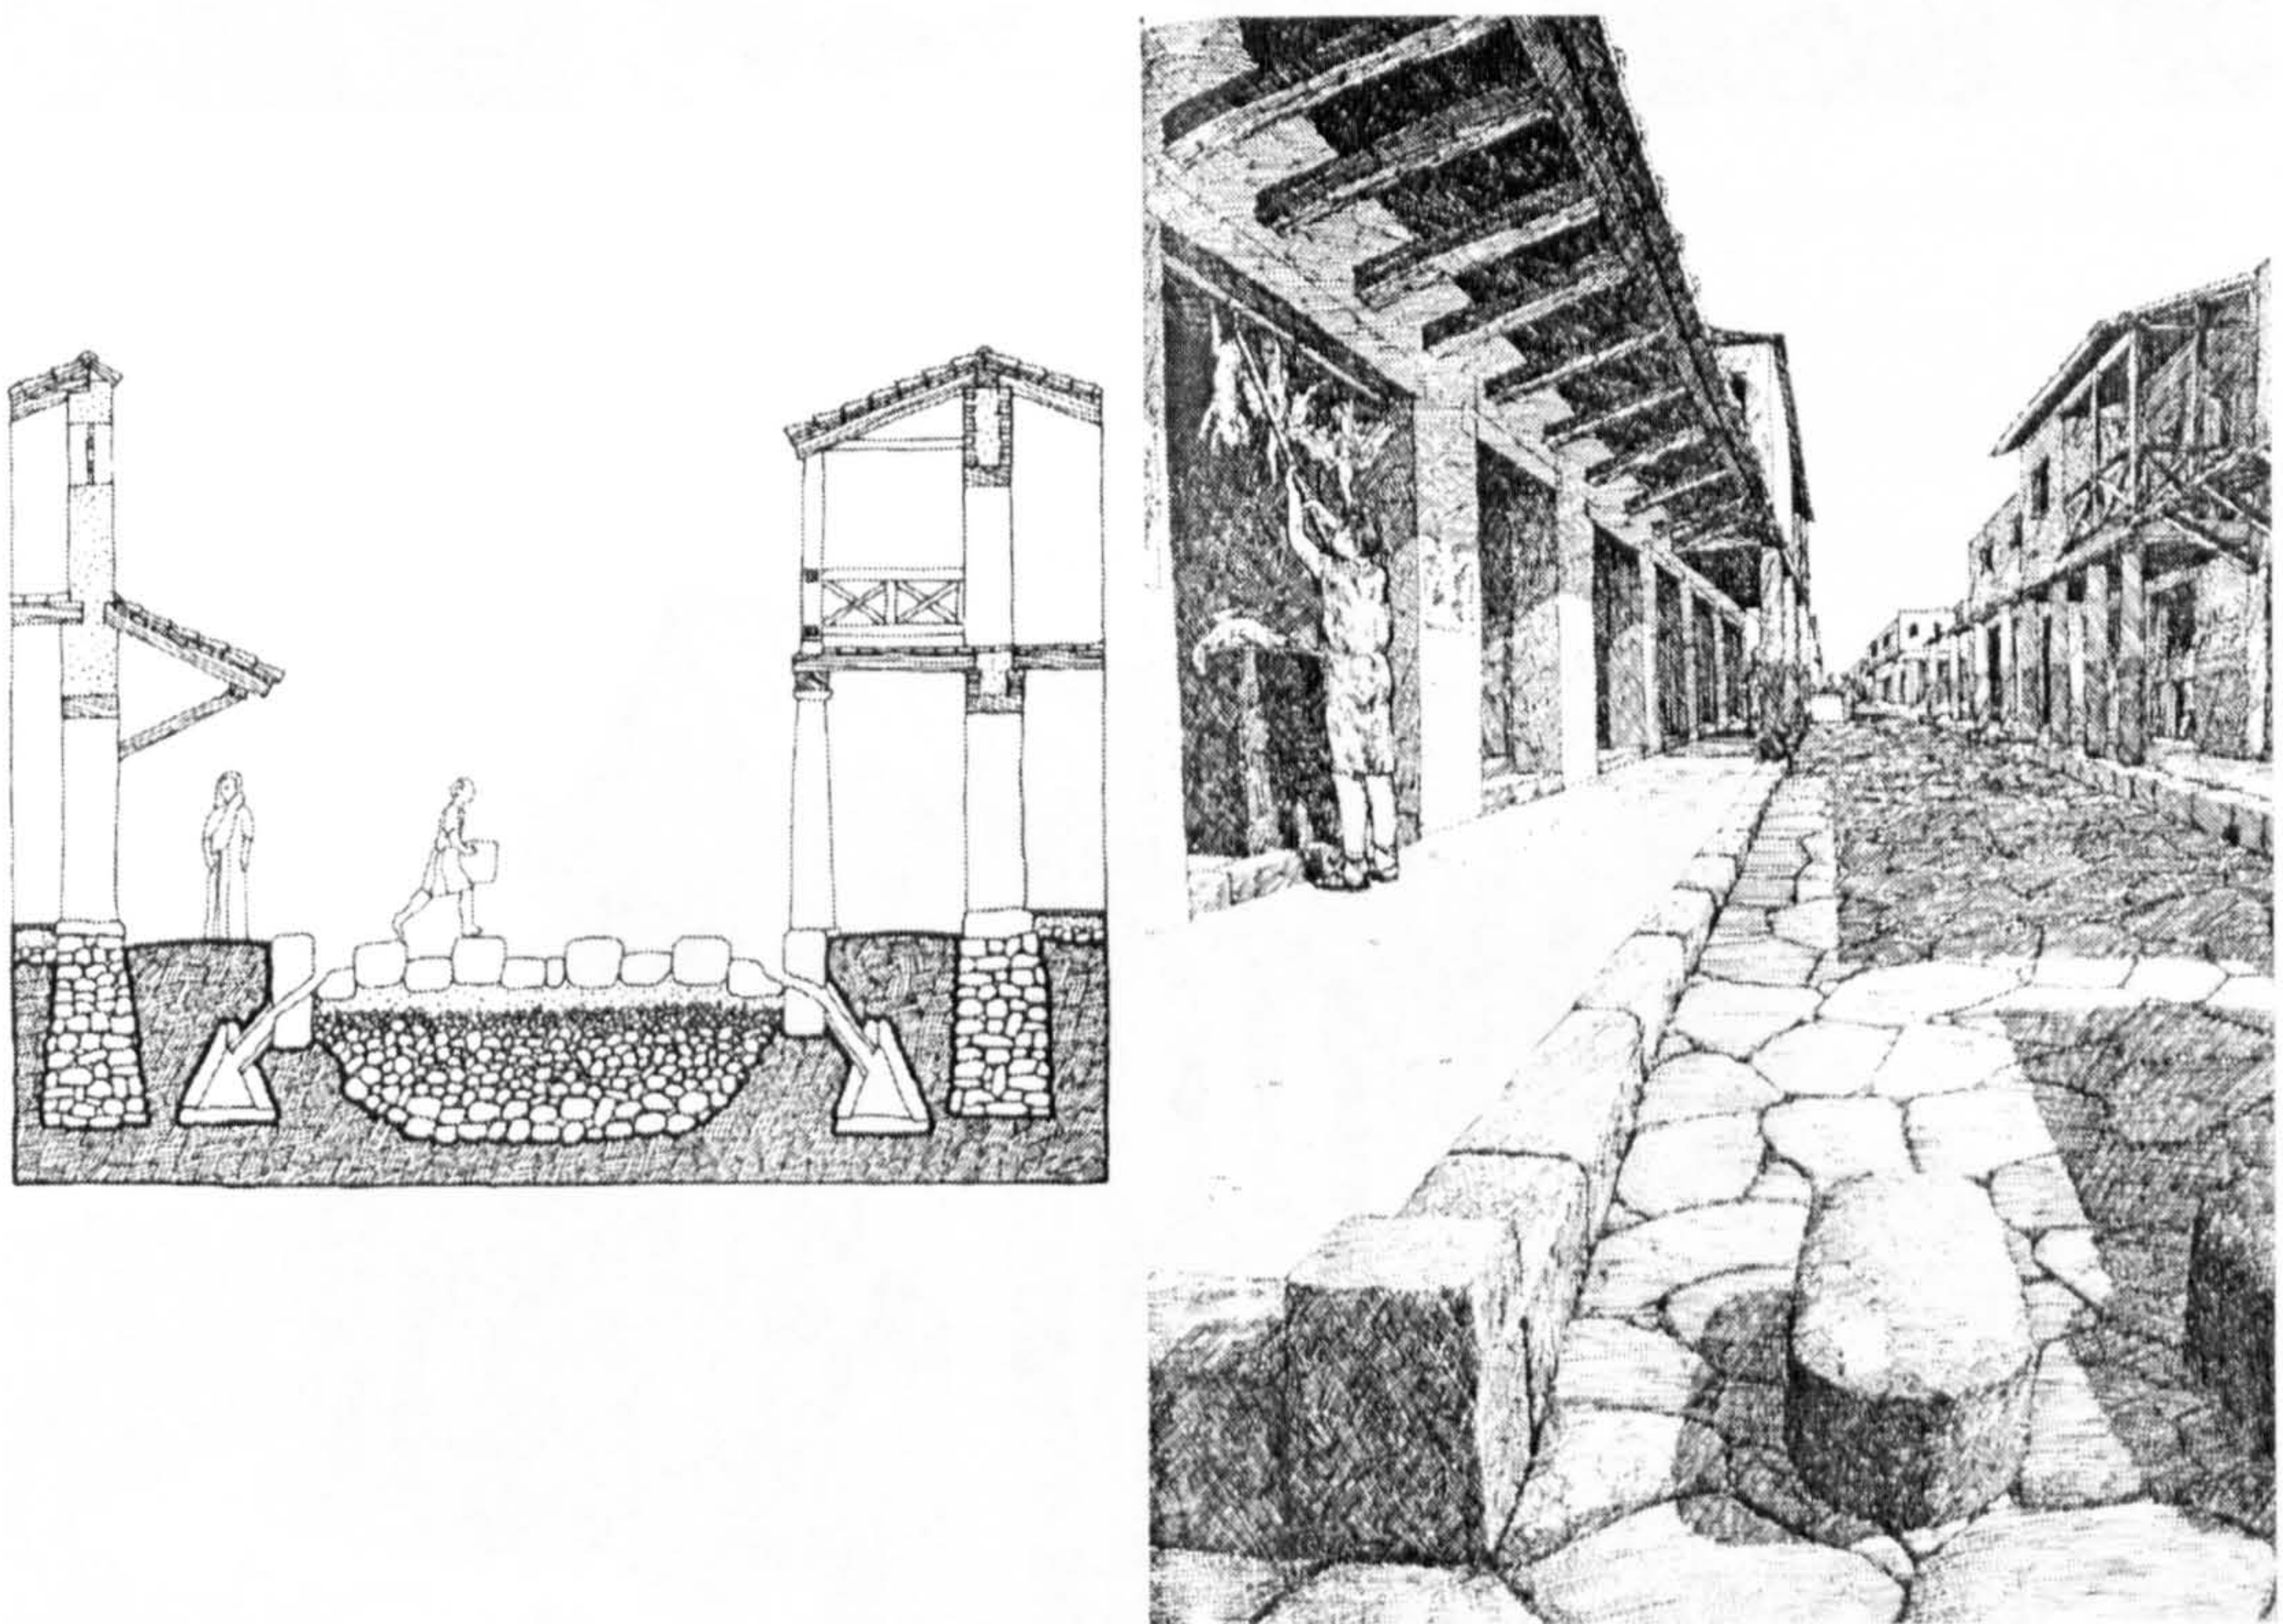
Section and perspective view illustrating the construction of a street and a sidewalk (Macaulay 1974)
